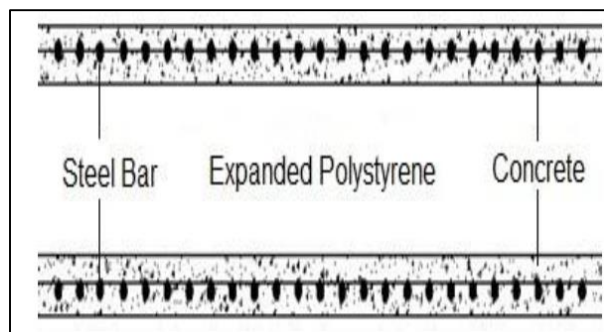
Schematic diagram of a tested panel (Source: Bajracharya *et al.* (2011))
